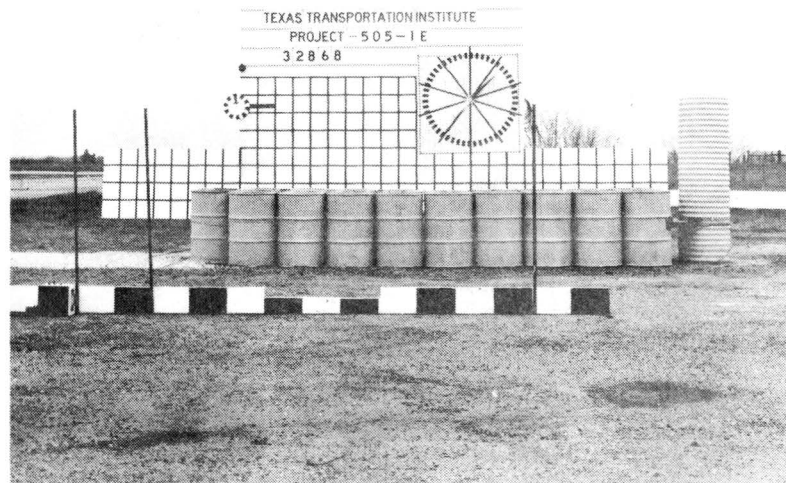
Side View of Barrel Protective Barrier in Front of 30 in. Diam. Simulated Bridge Pier
